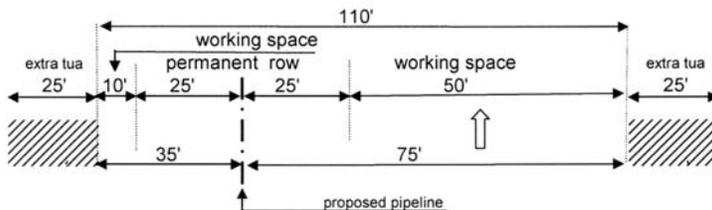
36" Pipeline ROW Layout with Access Roads and Extra TUAs
